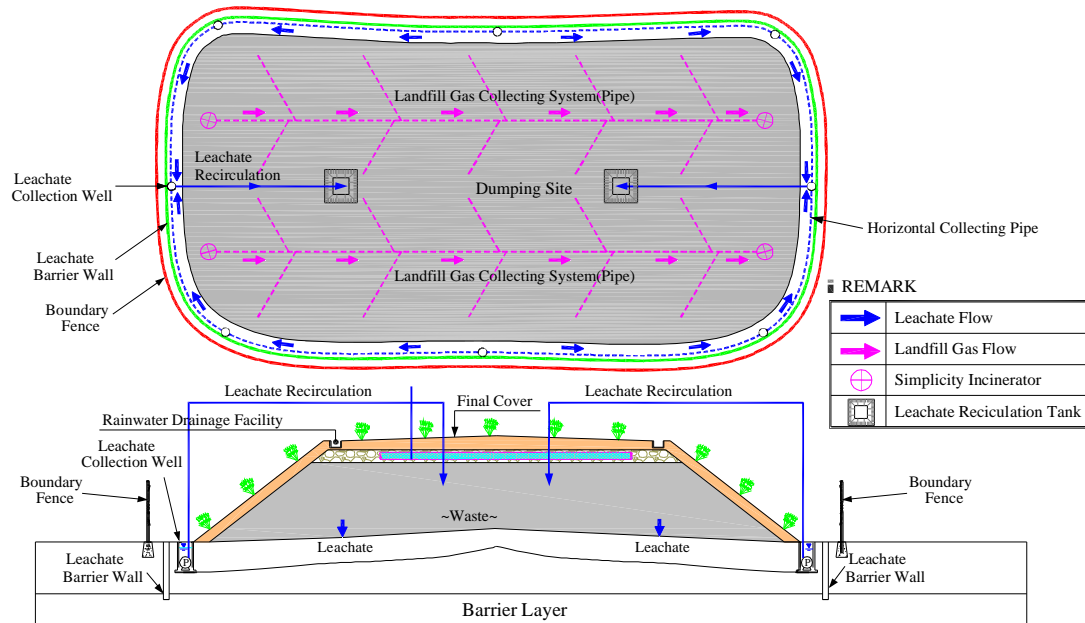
Layout plan on Mehmood Booti dumping site
